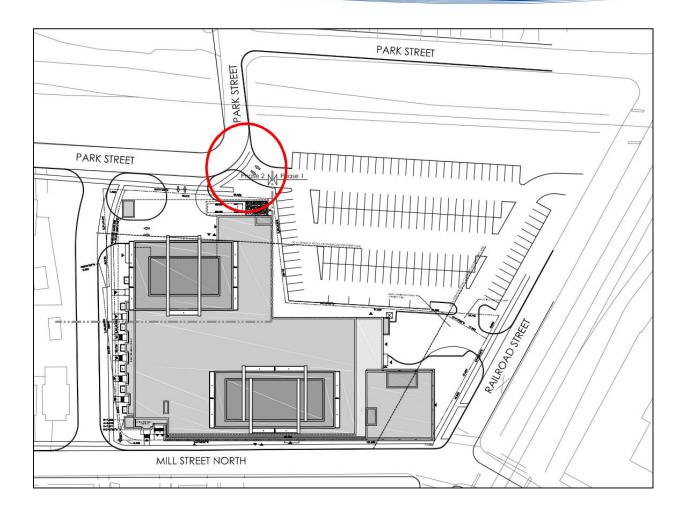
Site plan for 45 Railroad Street Development (areas of safety concern circled)
